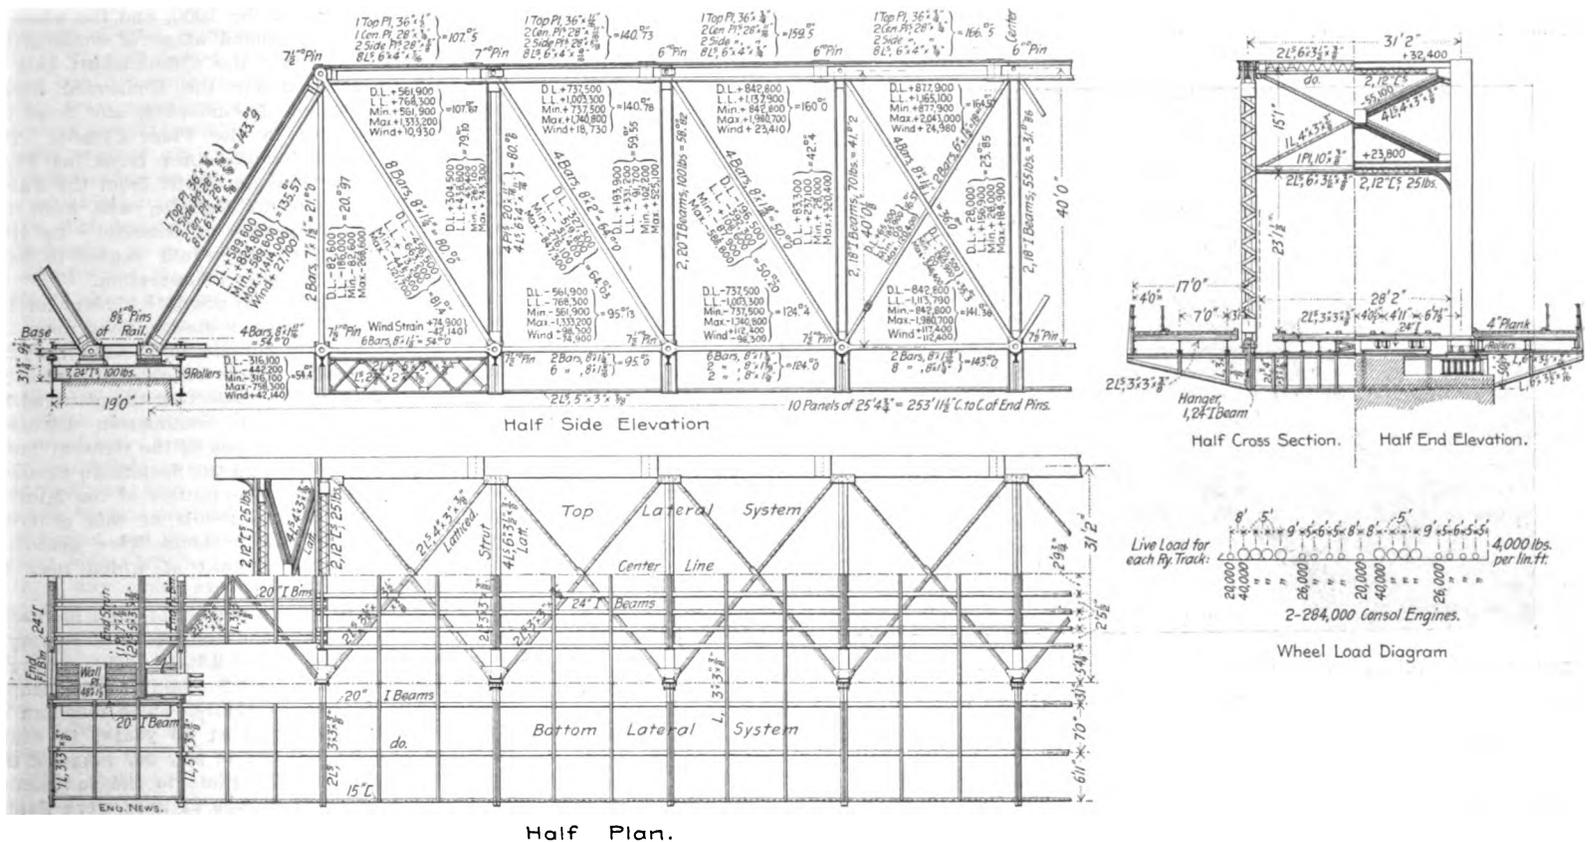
DETAILS OF NEW TRUSS SPANS FOR THE VICTORIA JUBILEE BRIDGE.
